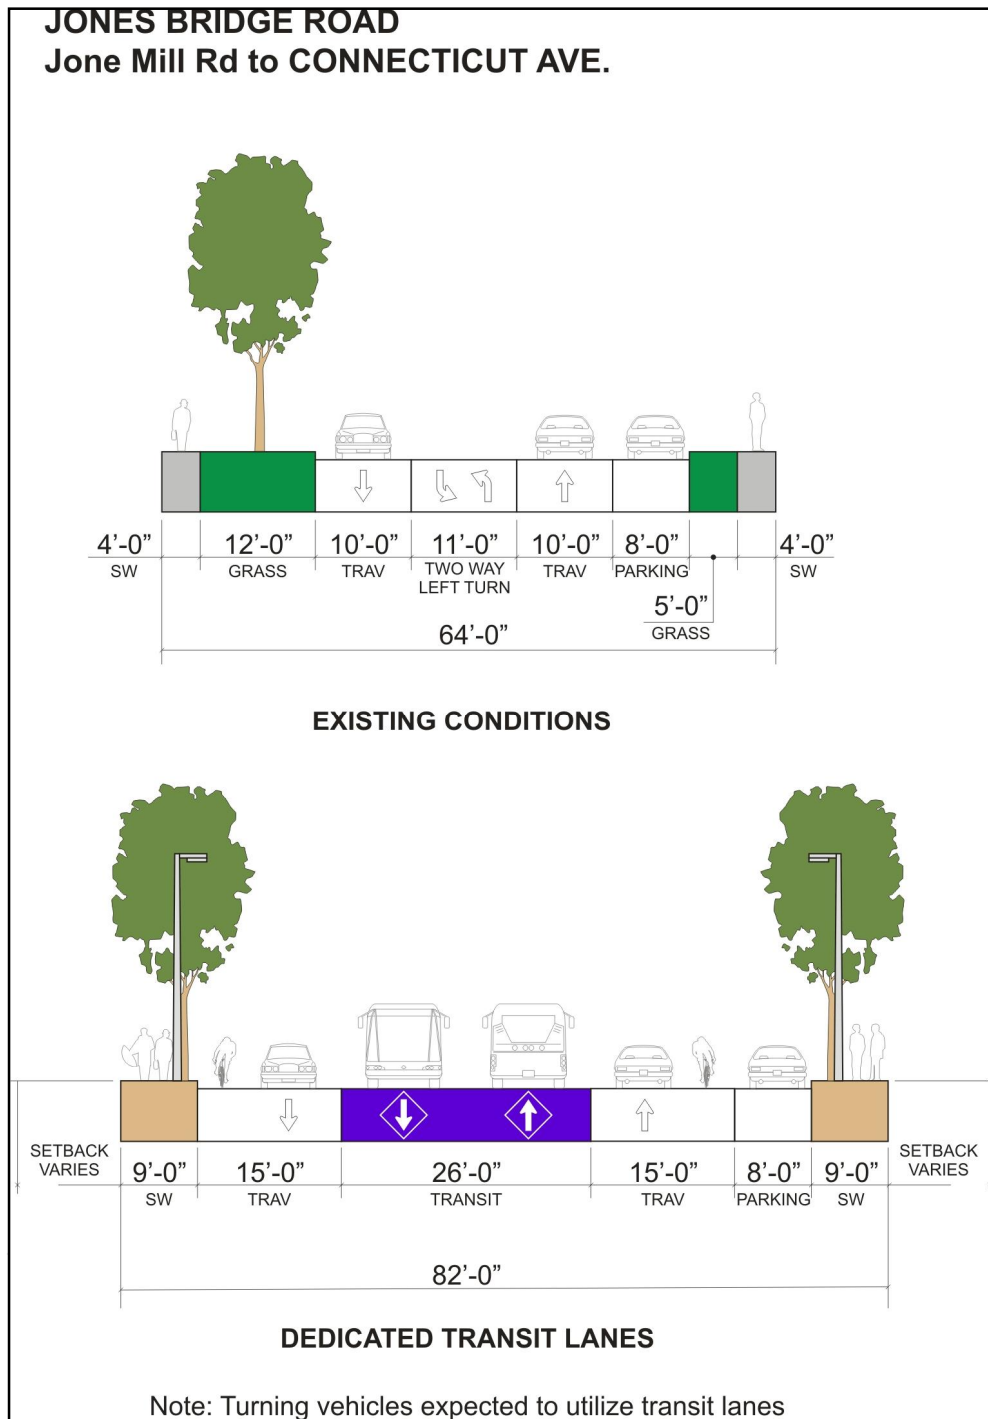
BRT Dedicated Lanes Cross-Section for Jones Bridge Road – Jones Mill Road to Connecticut Ave – Built to Standards
